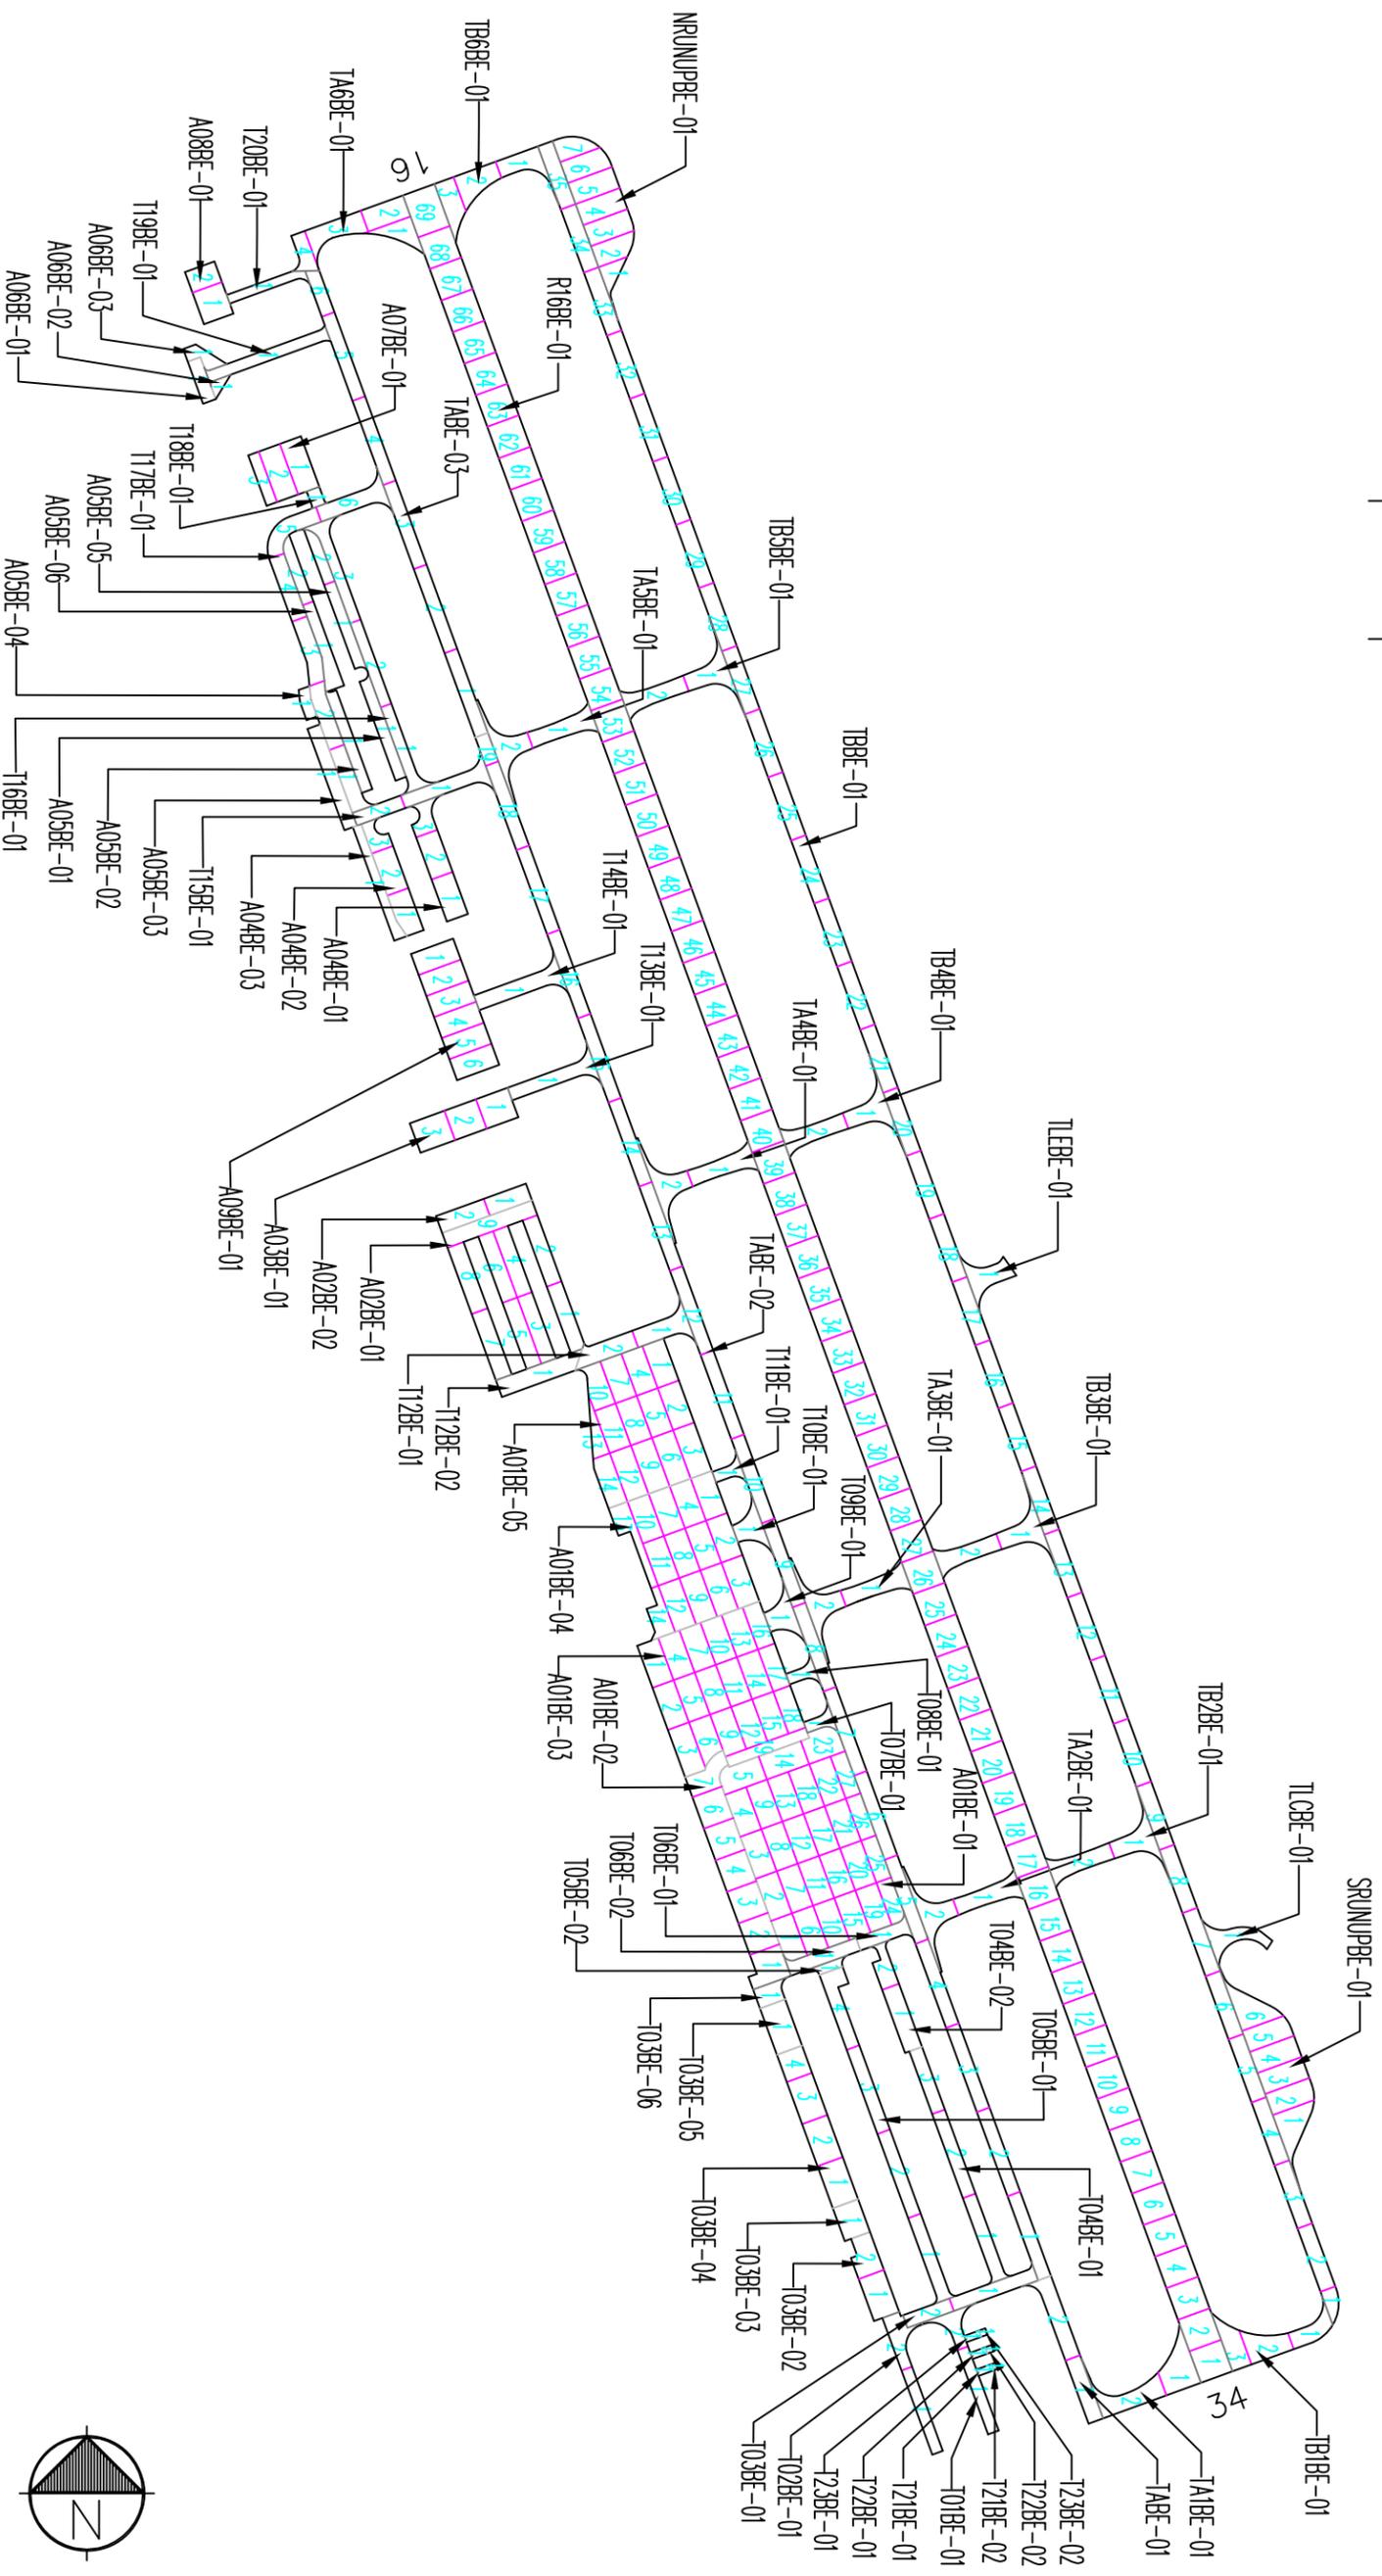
C. Airport Layout, Dimensions and Pavement Cross-Sections.
